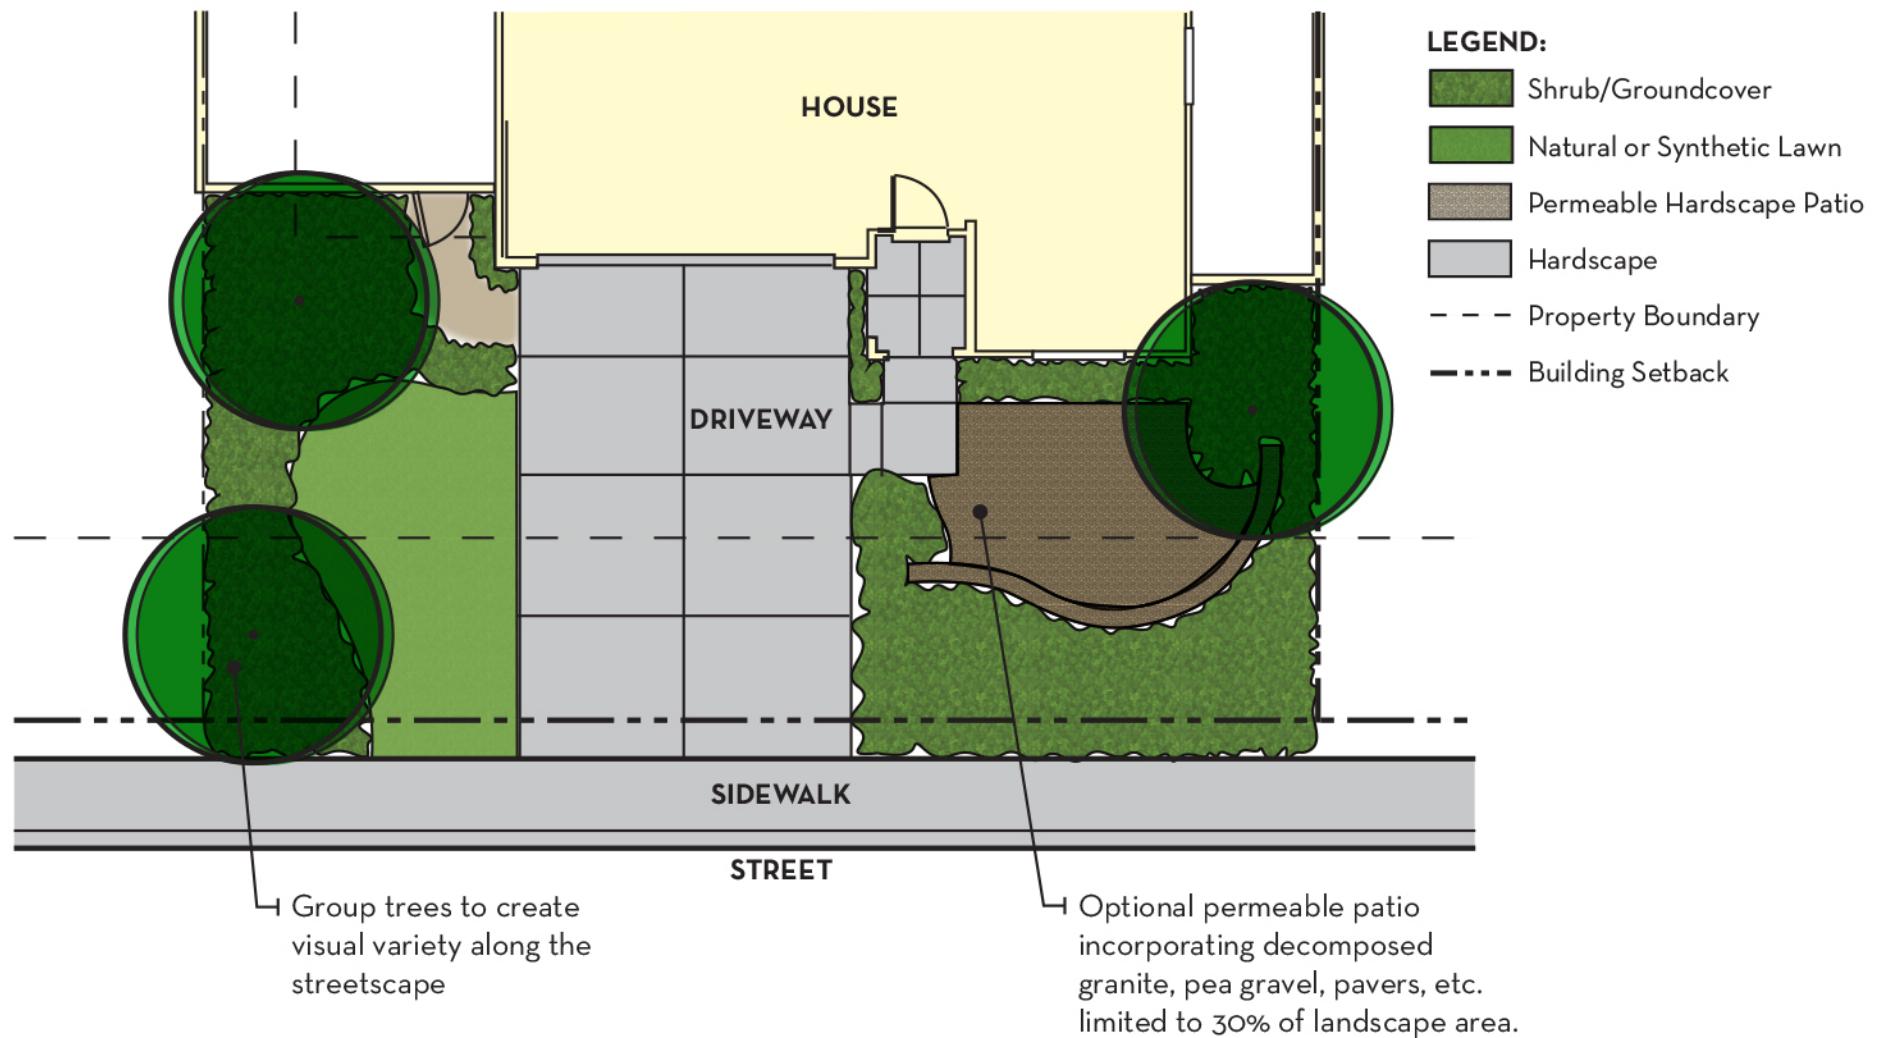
Courtyard Enclosure Conceptual Landscape Plan
